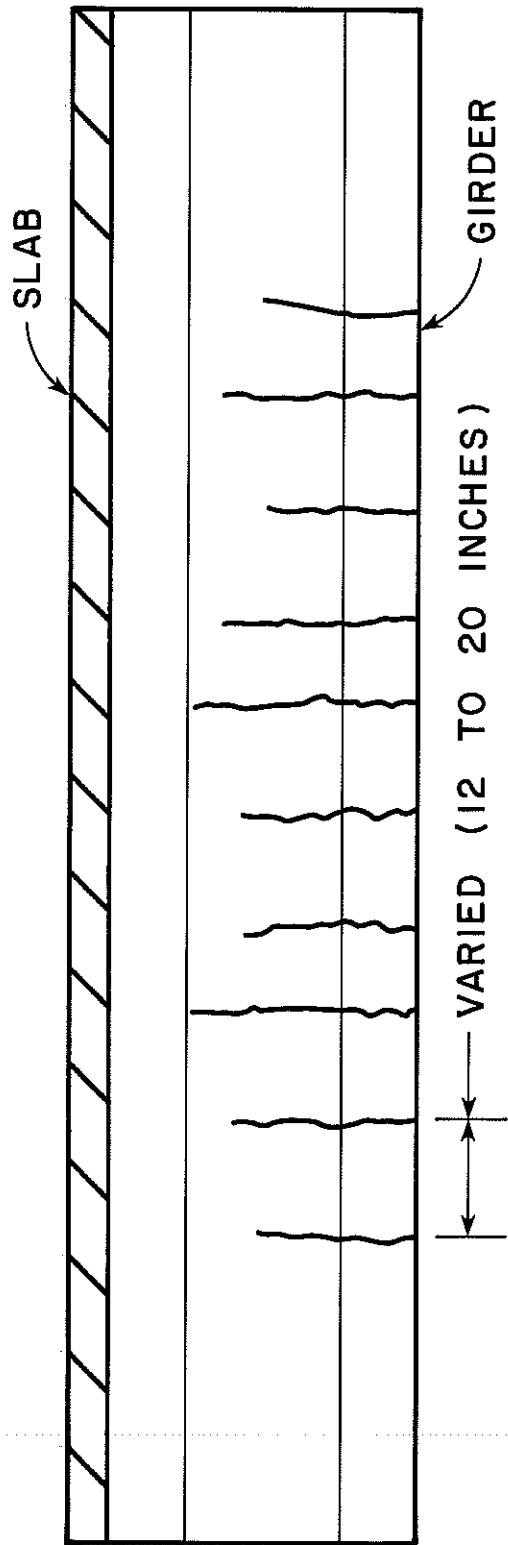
FLEXURALLY CRACKED GIRDER
